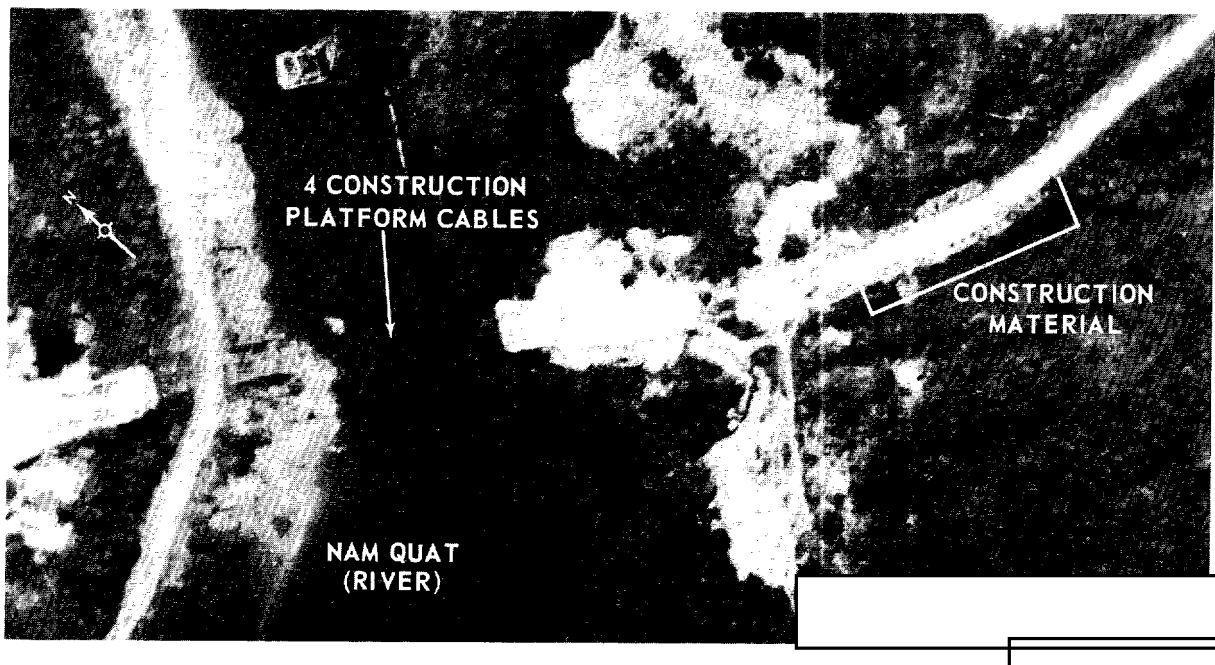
BRIDGE RECONSTRUCTION, ROUTE 15, NORTH VIETNAM
